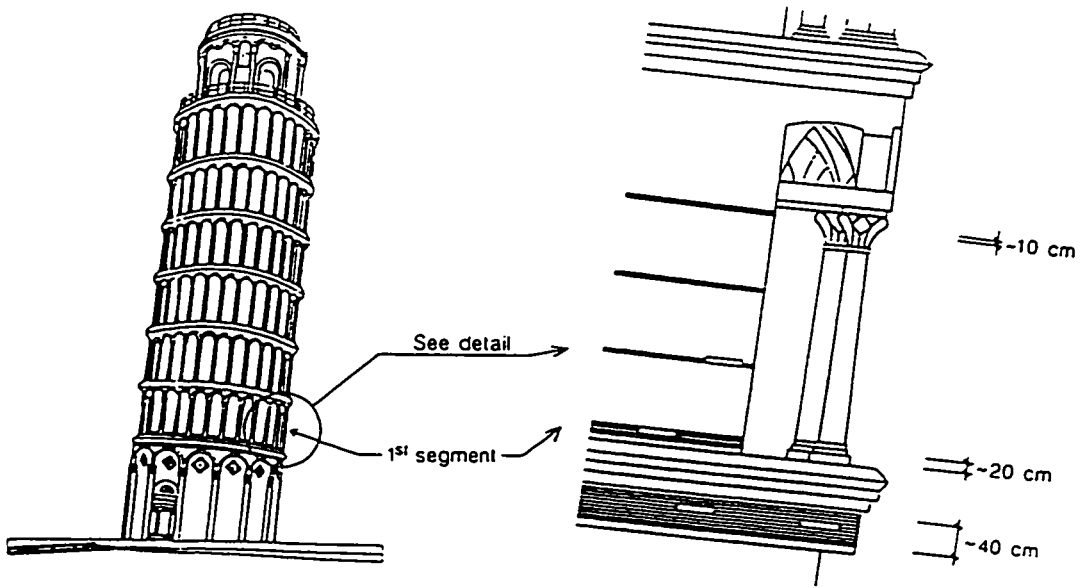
Temporary structural strengthening (light circumferential prestressing)
